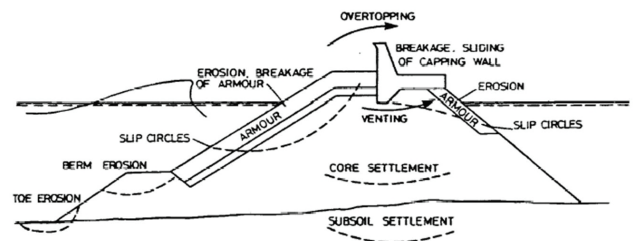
(b) Potential failure modes for breakwaters^[19]
